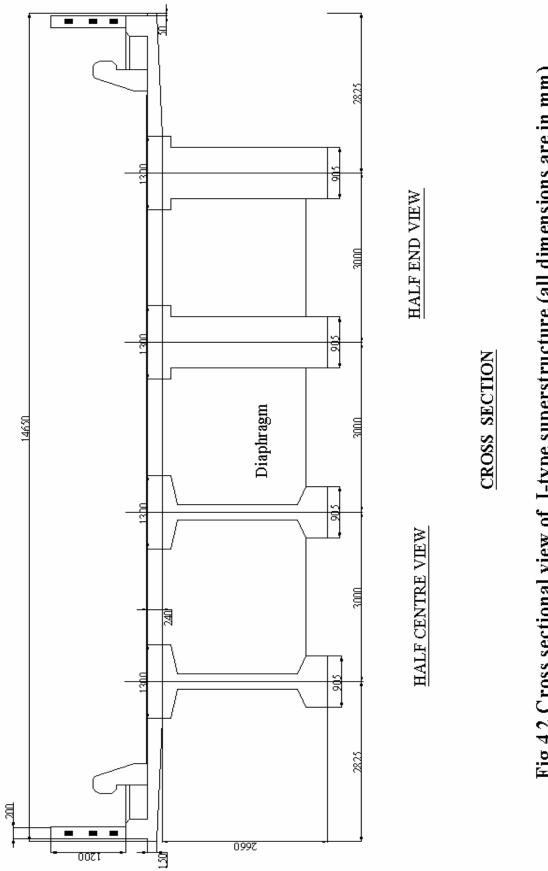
Cross sectional view of I-type superstructure (all dimensions are in mm)
